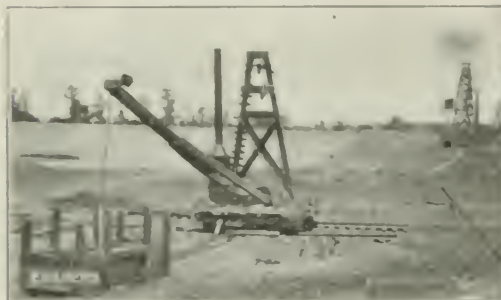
Looking toward levee. FIG. 2. Looking toward tail tower.
